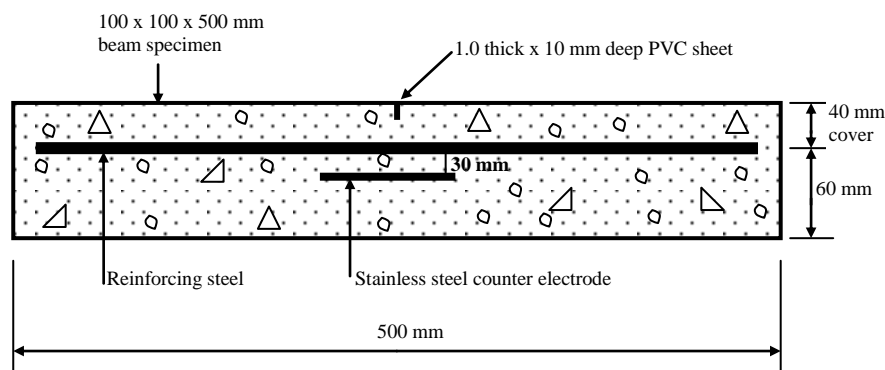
Schematic of a beam specimen with 1.0 mm thick PVC sheet
